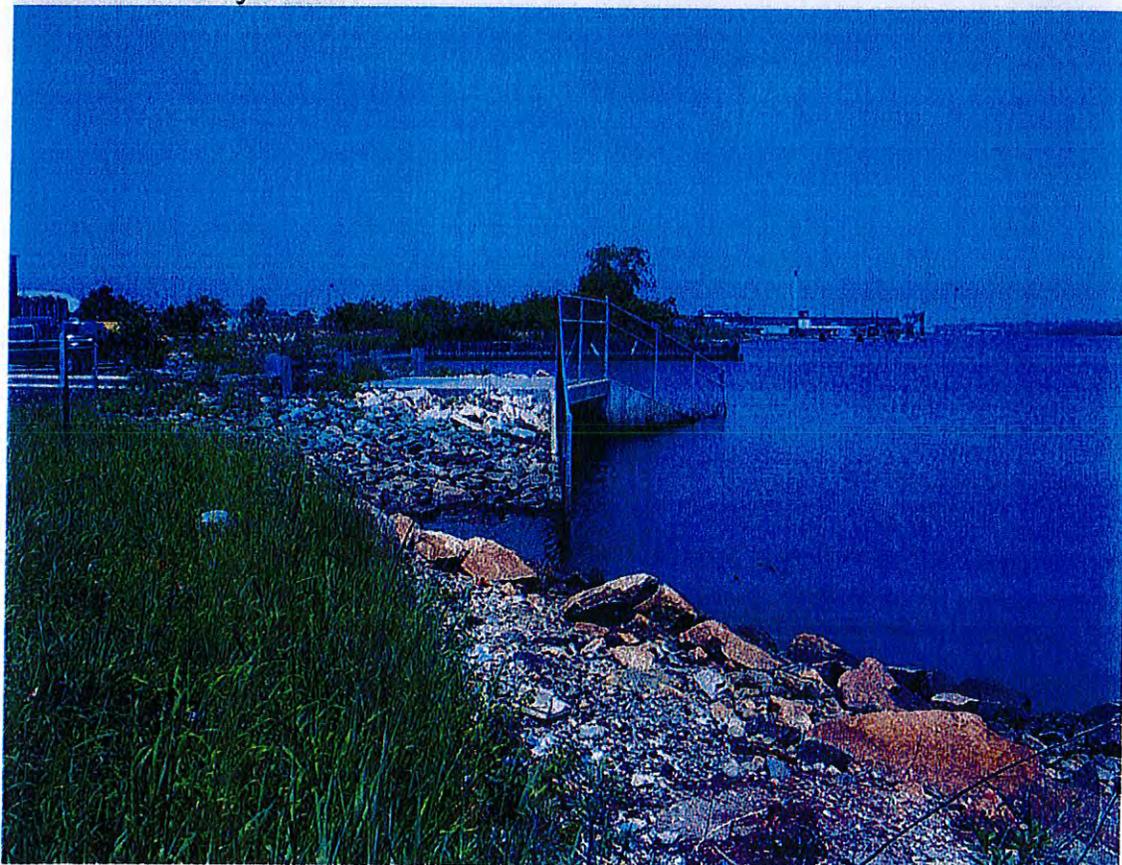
Sawyer Street Outfall and Coastal Bank
